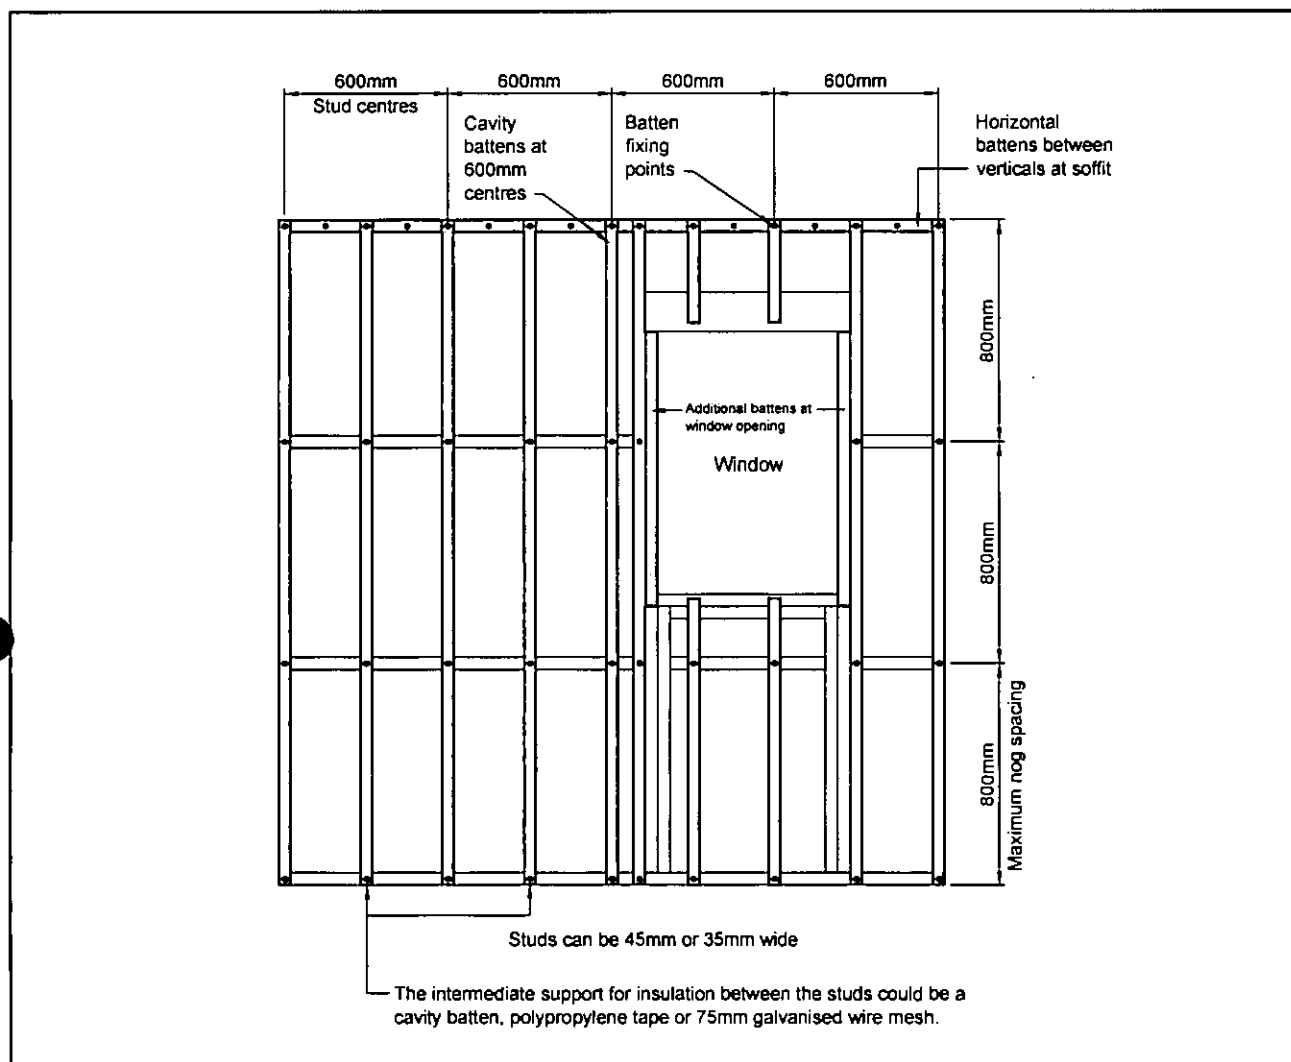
CAVITY BATTEN LAYOUT AT WINDOW OPENING
